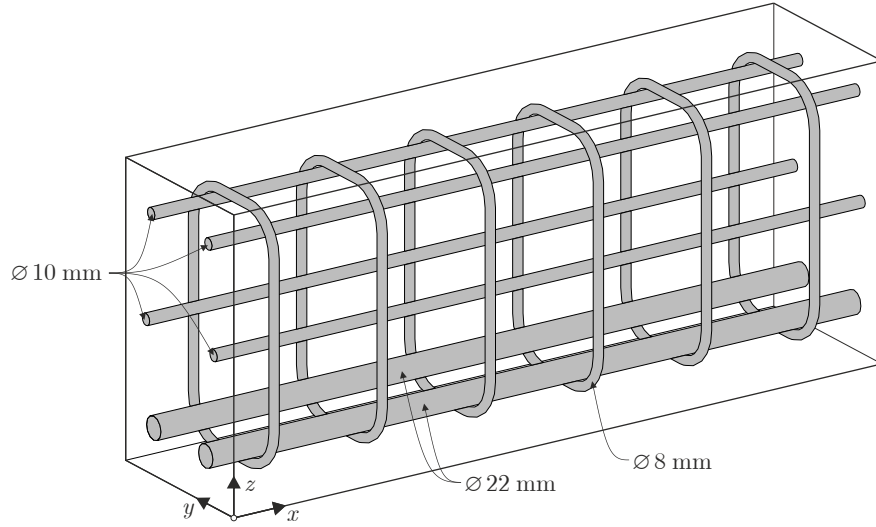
Three-dimensional model of a concrete cuboid including longitudinal reinforcing bars, and stirrups with 100 mm spacings.
